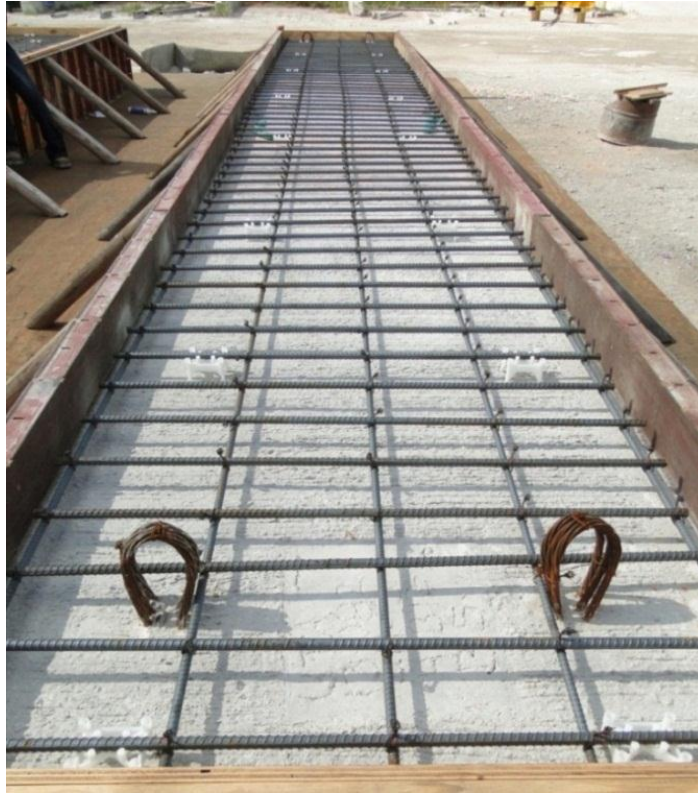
Box beam with CIP reinforcement but without shear reinforcement
